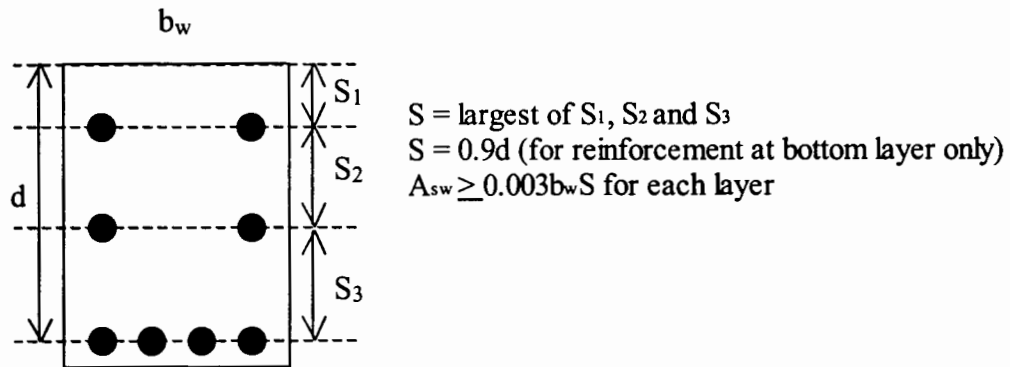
Beam section with longitudinal web reinforcement in several layers
